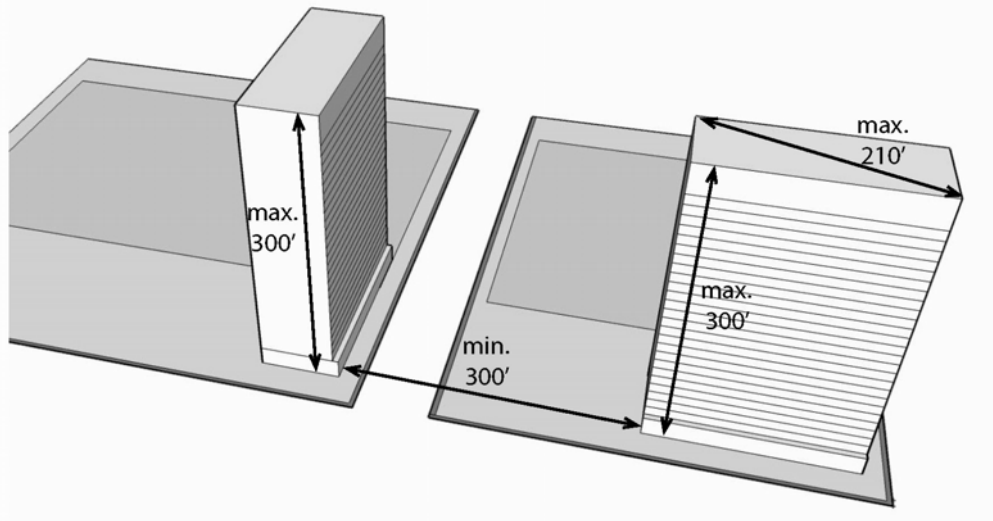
Height, Bulk and Spacing for Buildings 200’ to 300’ High near a Building 200’ to 300’ High
